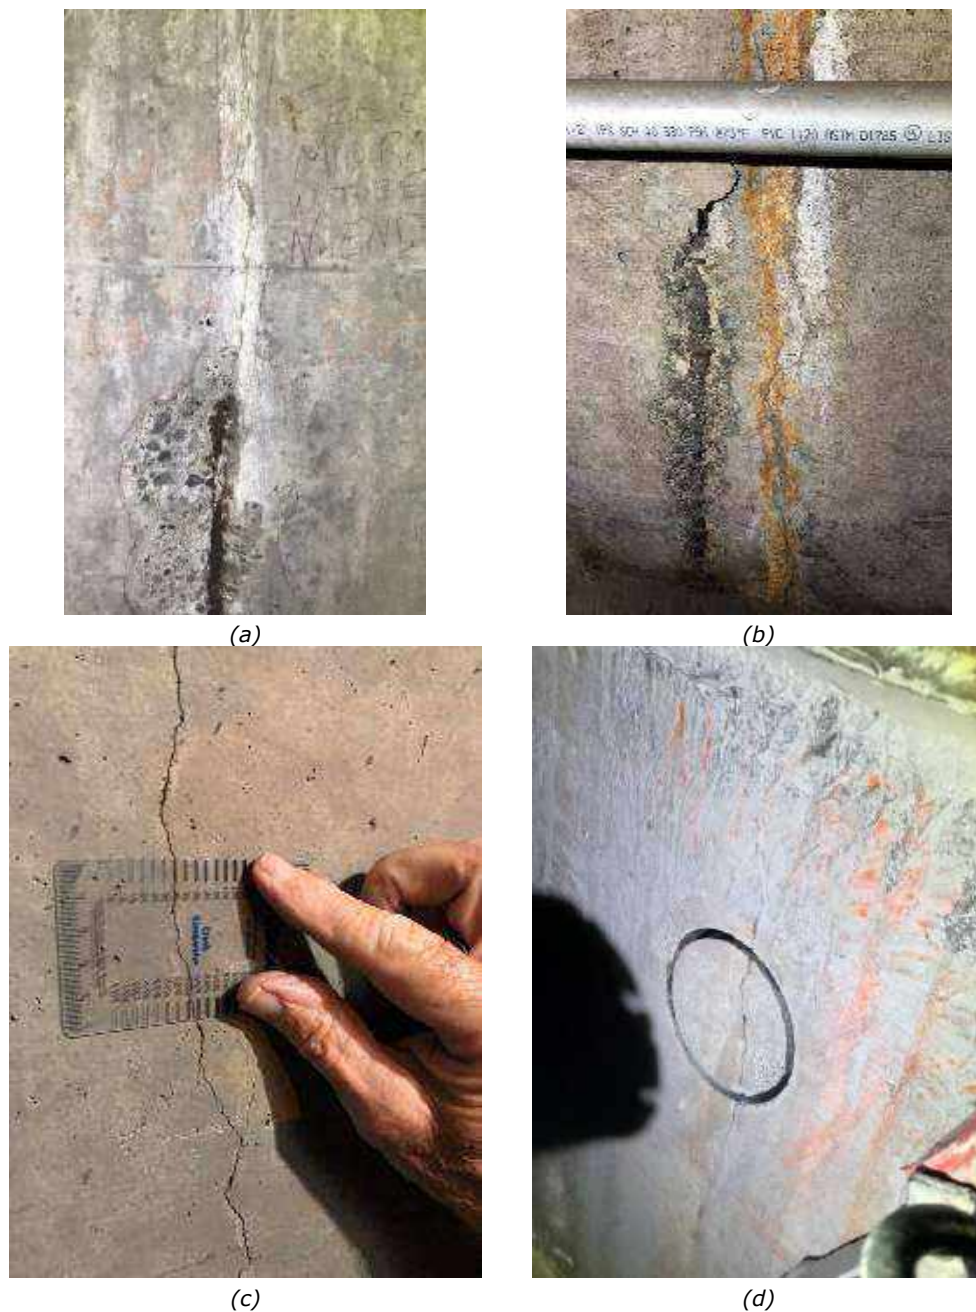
Transverse cracks observed in the outer walls of the air duct tubes, including (a) a dry crack with efflorescence and spalling at a location with ~35 mm cover (Downstream Air Duct, Element III, Door 17/18, powder samples collected), (b) a dry crack with efflorescence and corrosion staining (Downstream Air Duct, Element IV, Door 23/34), (c) a dry crack without staining (Downstream Air Duct, Element IV Door 20), (d) a dry crack without staining after core drilling (Upstream Air Duct, Joint II/III, Core JUE-P3-C2 collected, coring slurry seen on concrete surface).
